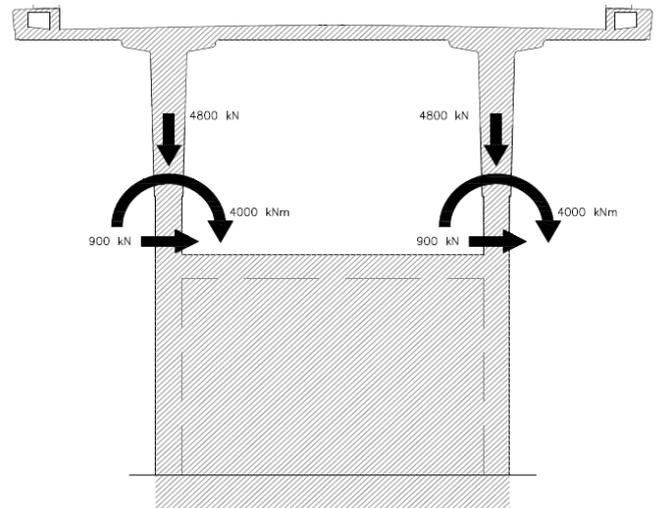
Particular of the connection pier/deck (1/2)/particolare connessione pila impalcato (1/2).
